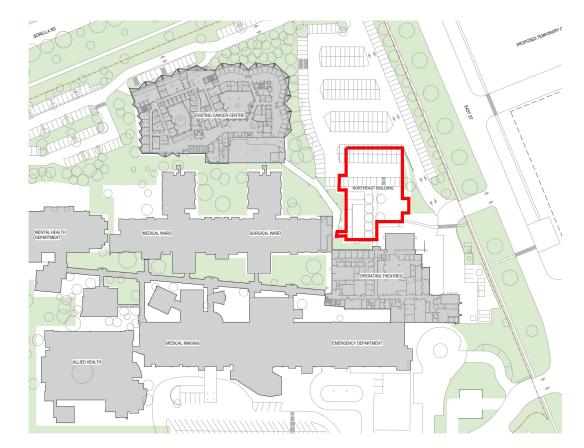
Albury Hospital Campus and Proposed Northeast Building
